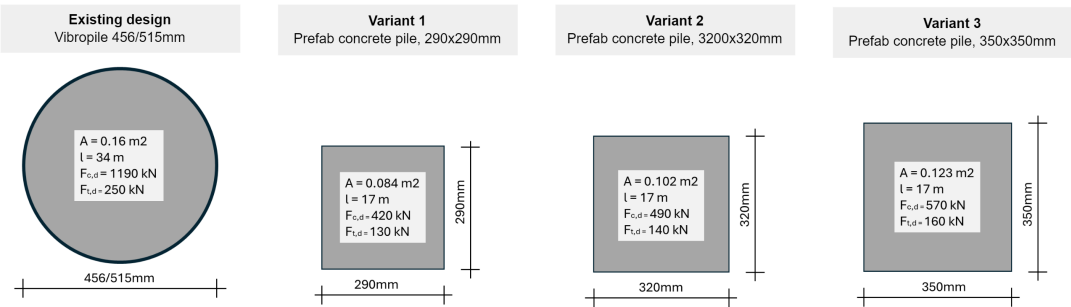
Schematisation of the original foundation piles and proposed alternatives.
